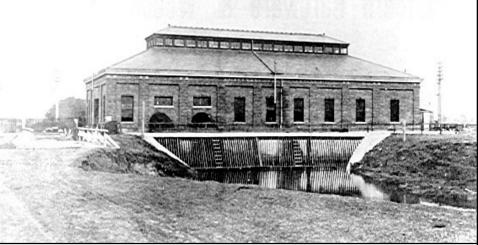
Drainage Pumping Station No. 3 as originally constructed, 1909 (from Sewerage & Water Board 1909).
